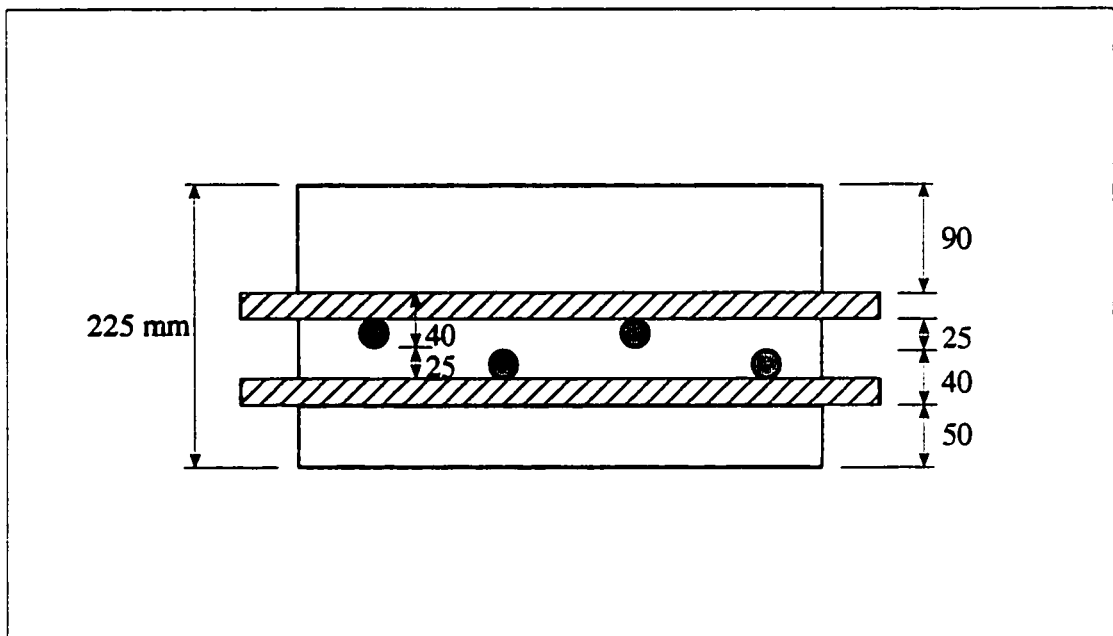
Tolerances for location of reinforcing steel bars in deck slabs
